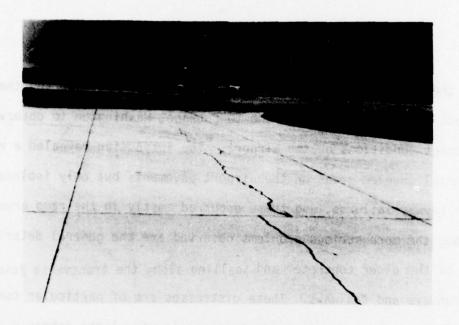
Reflective Crack Through Concrete Slab on an Econocrete Subbase, Shreveport.
